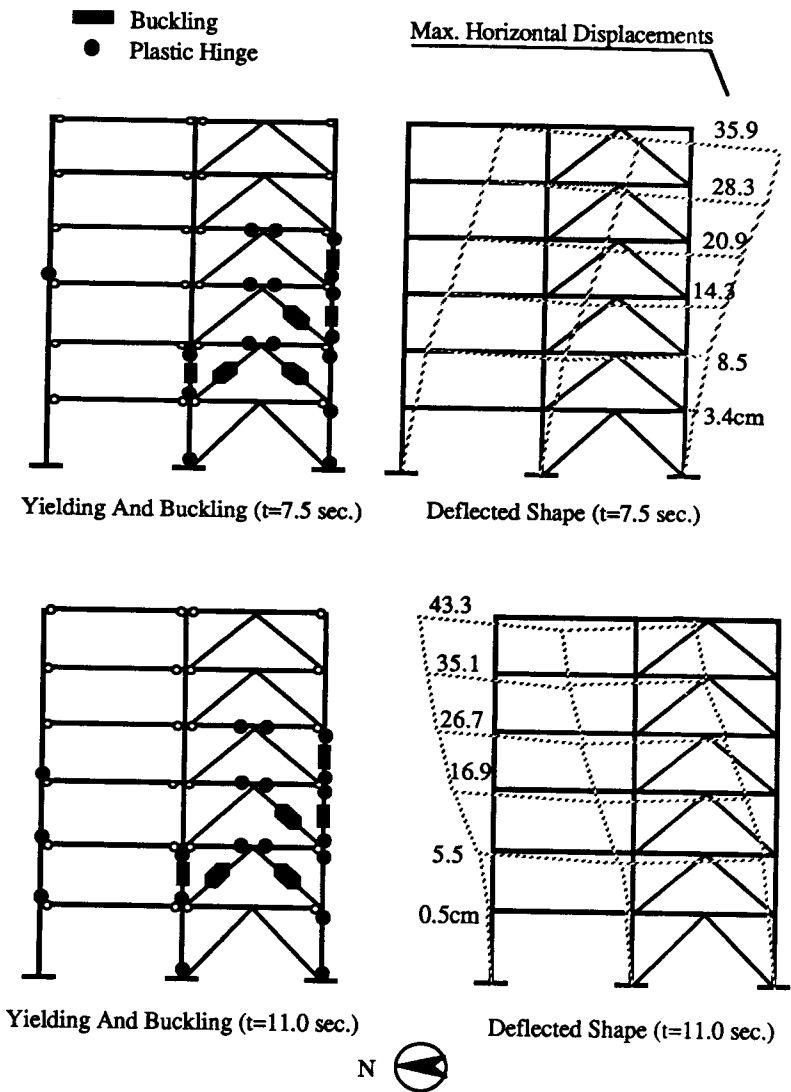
Yield condition and deformed shape of six-story braced structure (Goel and Tang, 1987).
